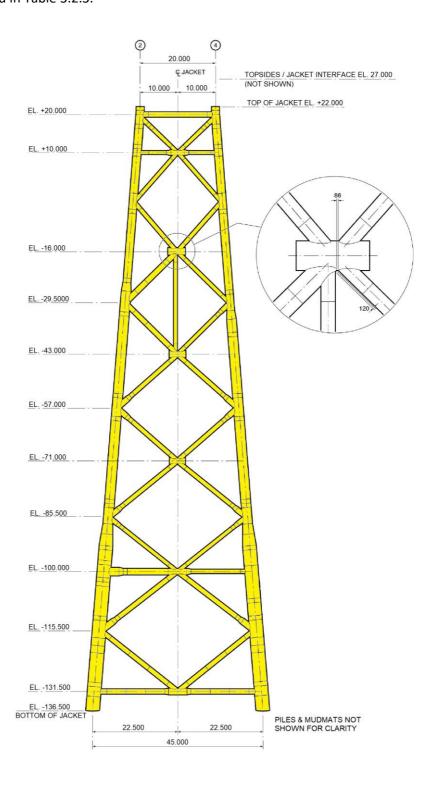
Solan jacket elevation on row 'A' (rows 'B', '2' & '4' similar)
